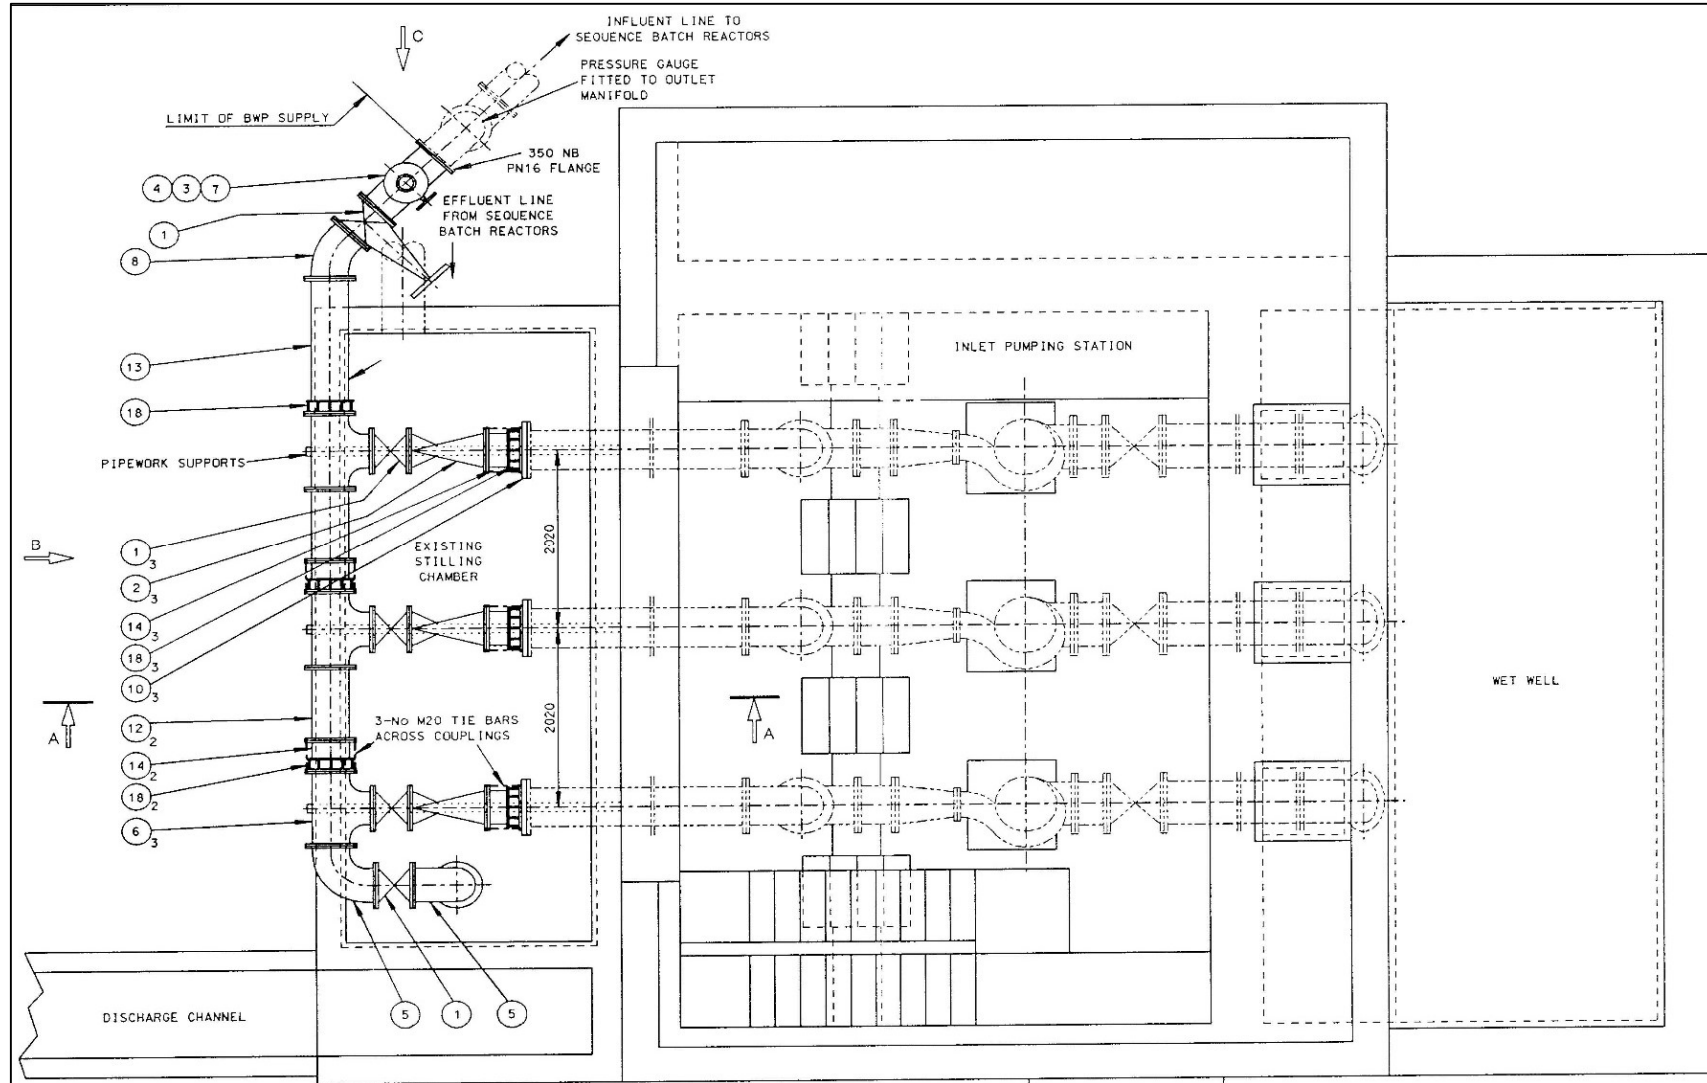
Schematic plan showing the layout of the PLS viewed from above
